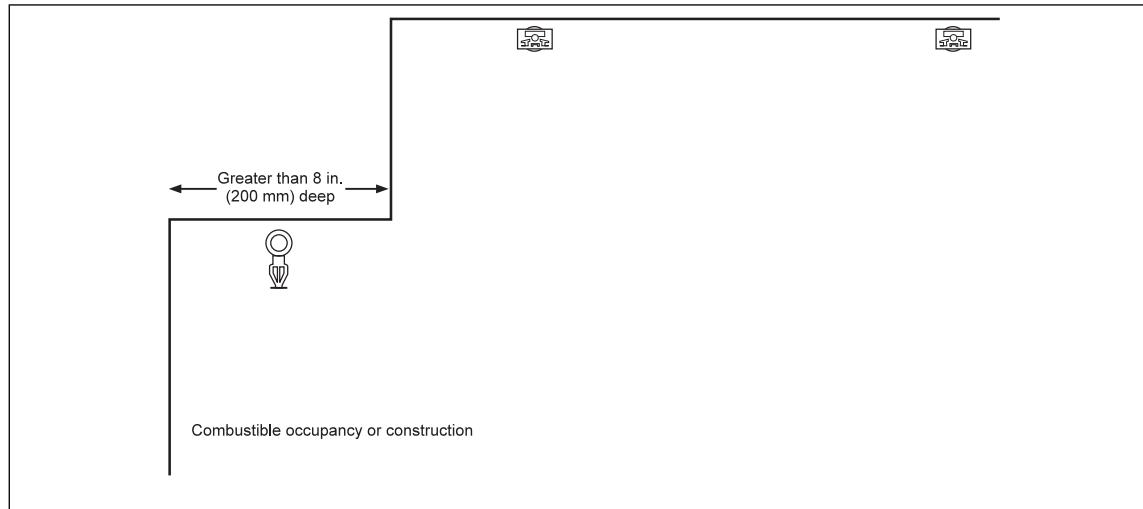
Nonstorage sidewall sprinklers under combustible shielded areas more than 8 in. (200 mm) deep
